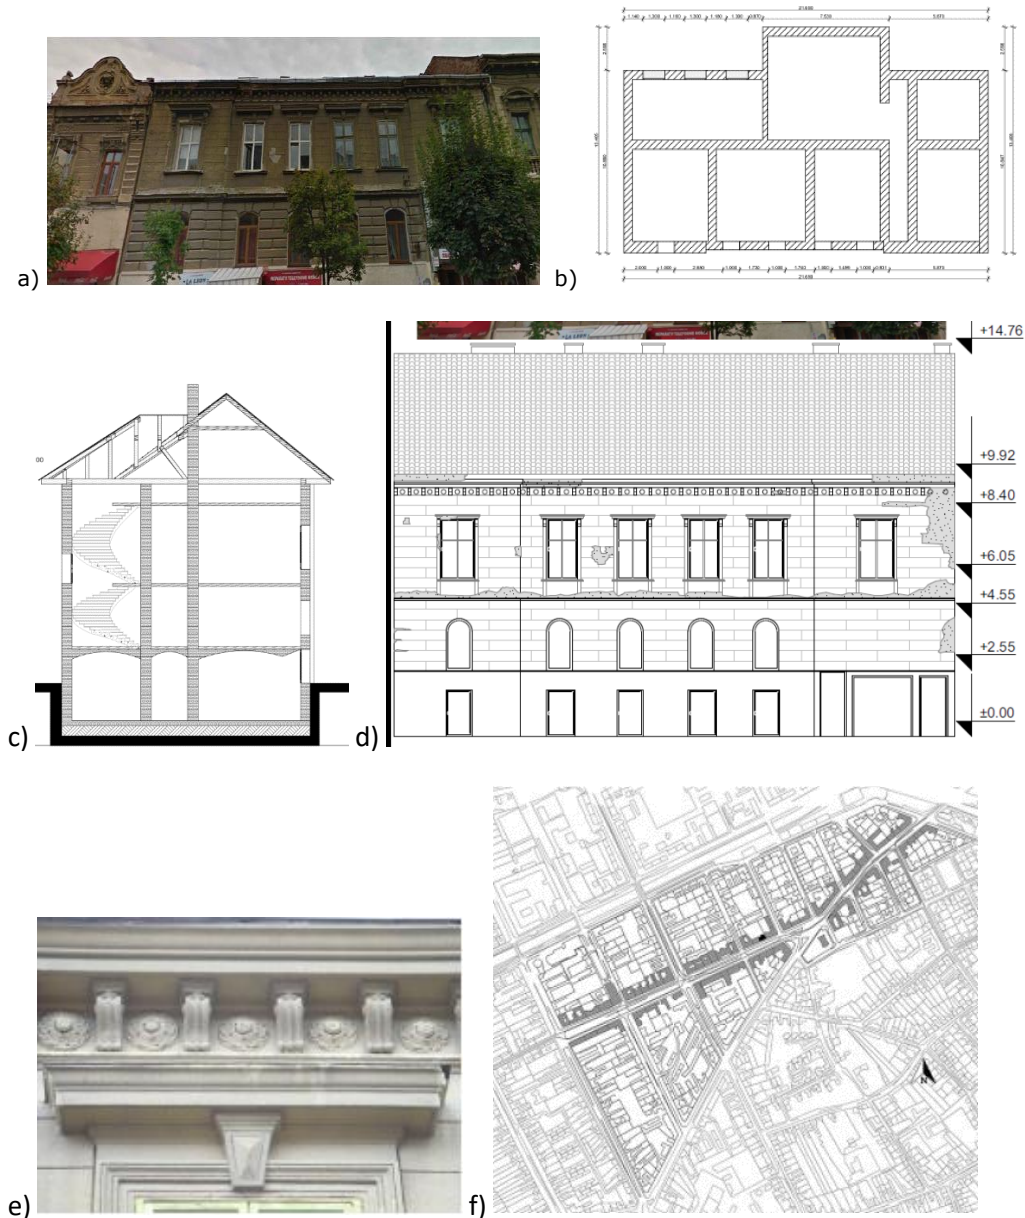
Typological class type II historical masonry buildings for Iosefin district: a) image of the buildings in the current state; b) ground floor plan; c) section; d) façade; e) architectural-artistic elements; f) location
